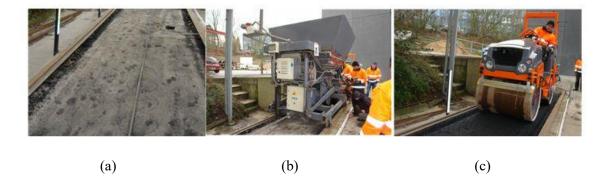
Asphalt mixture paving of test section: (a) test section before asphalt paving; (b) paving of asphalt mixture; (c) compaction of asphalt mixture
